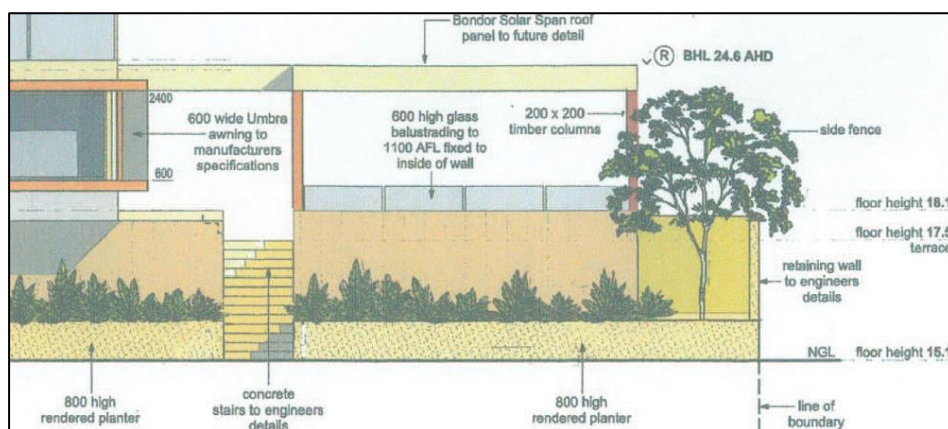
Proposed ground levels: Terrace and retaining walls (as viewed from River Way)
